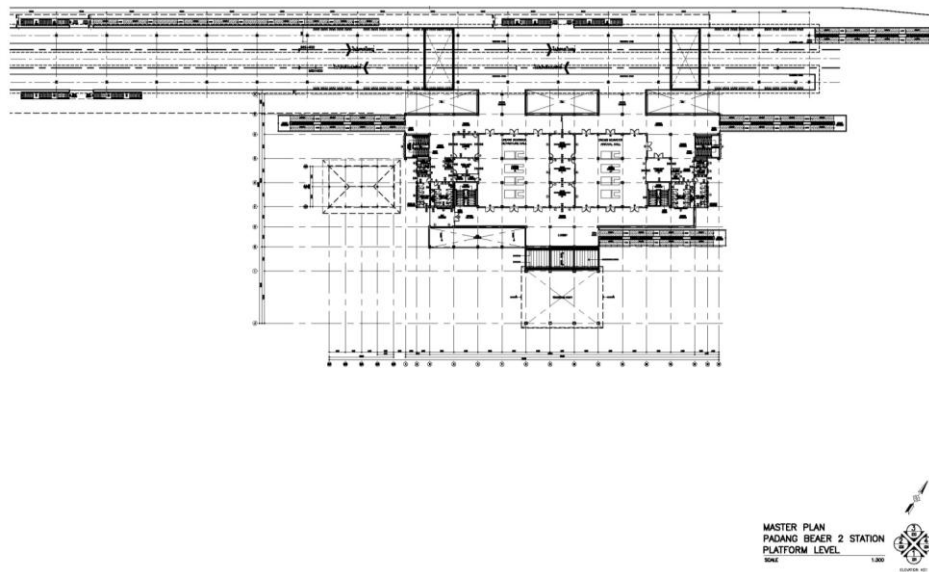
Platform Plan of Padang Besar 2 Station
